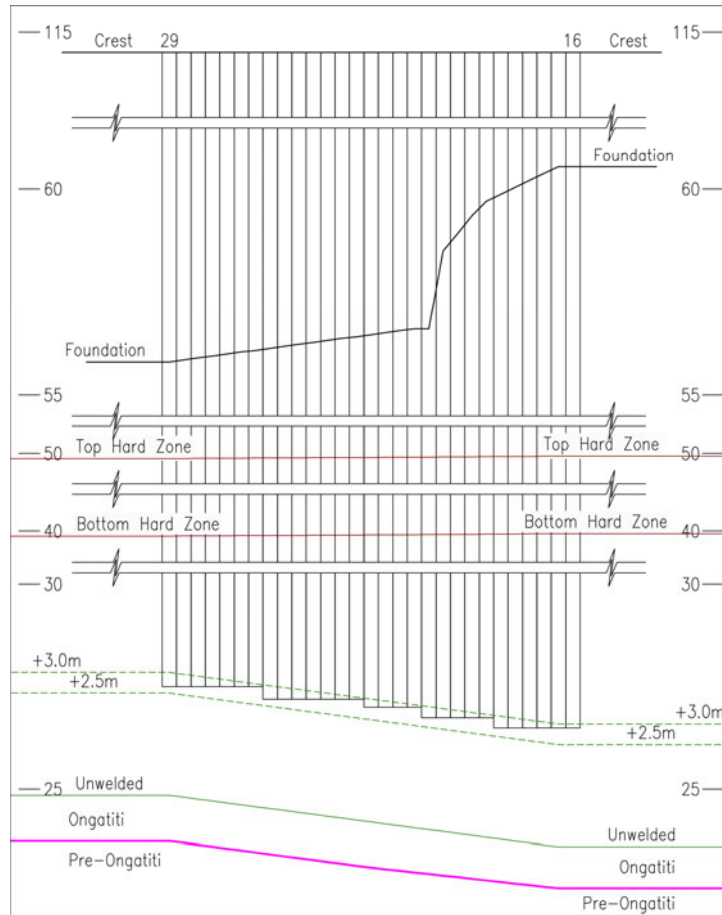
Typical Elevation of a Treatment Panel (Panel B)
